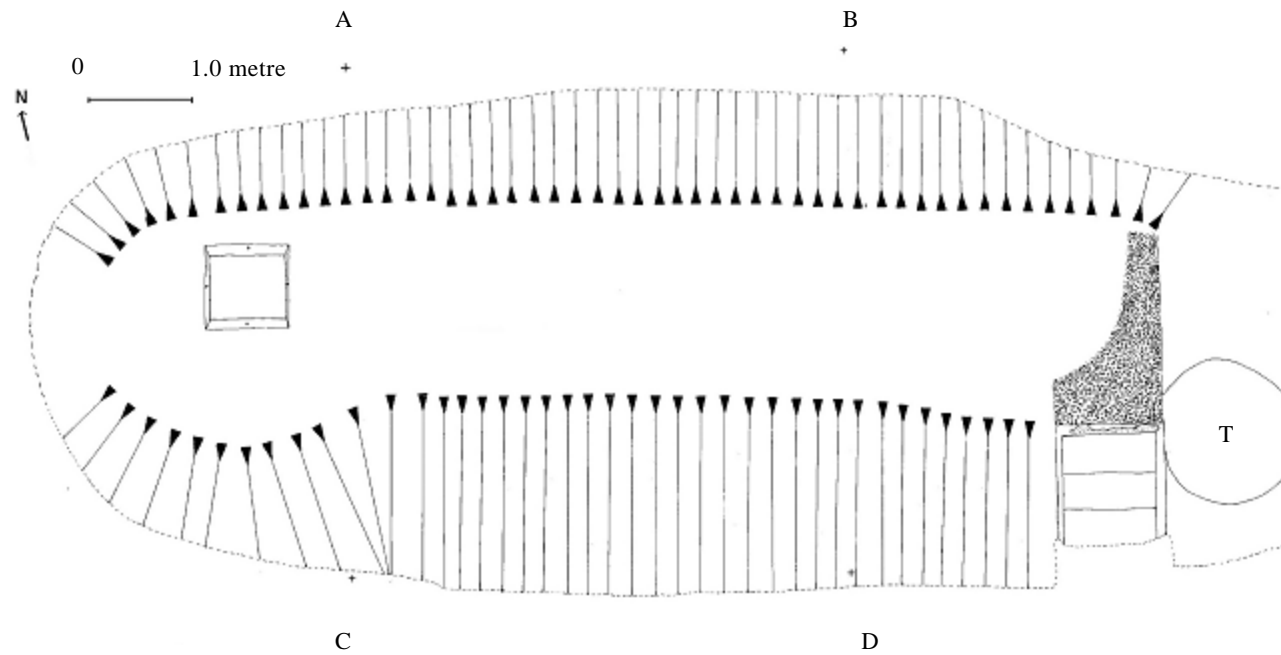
Plan of Air Raid Shelter 2 at Warstones
